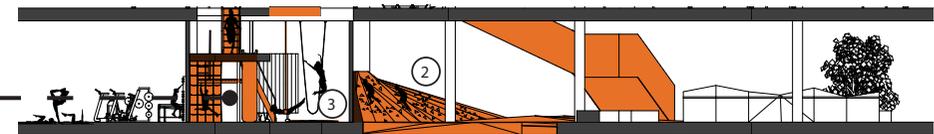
Section through areas 3 (exercise area) and 2 (interior climbing wall). Scale 1:300
